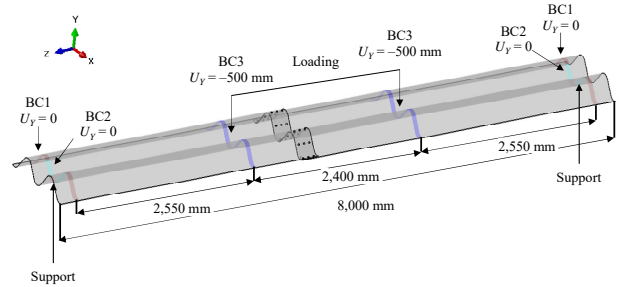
Four-point loading test setup and dimensions (Unit: mm)
